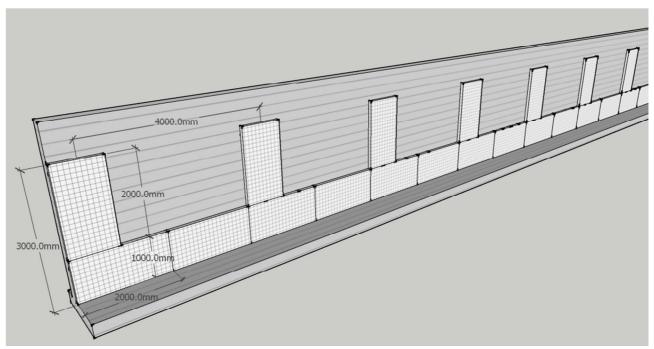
Arrangement of drainage pillars, wheelbase of 4 m
